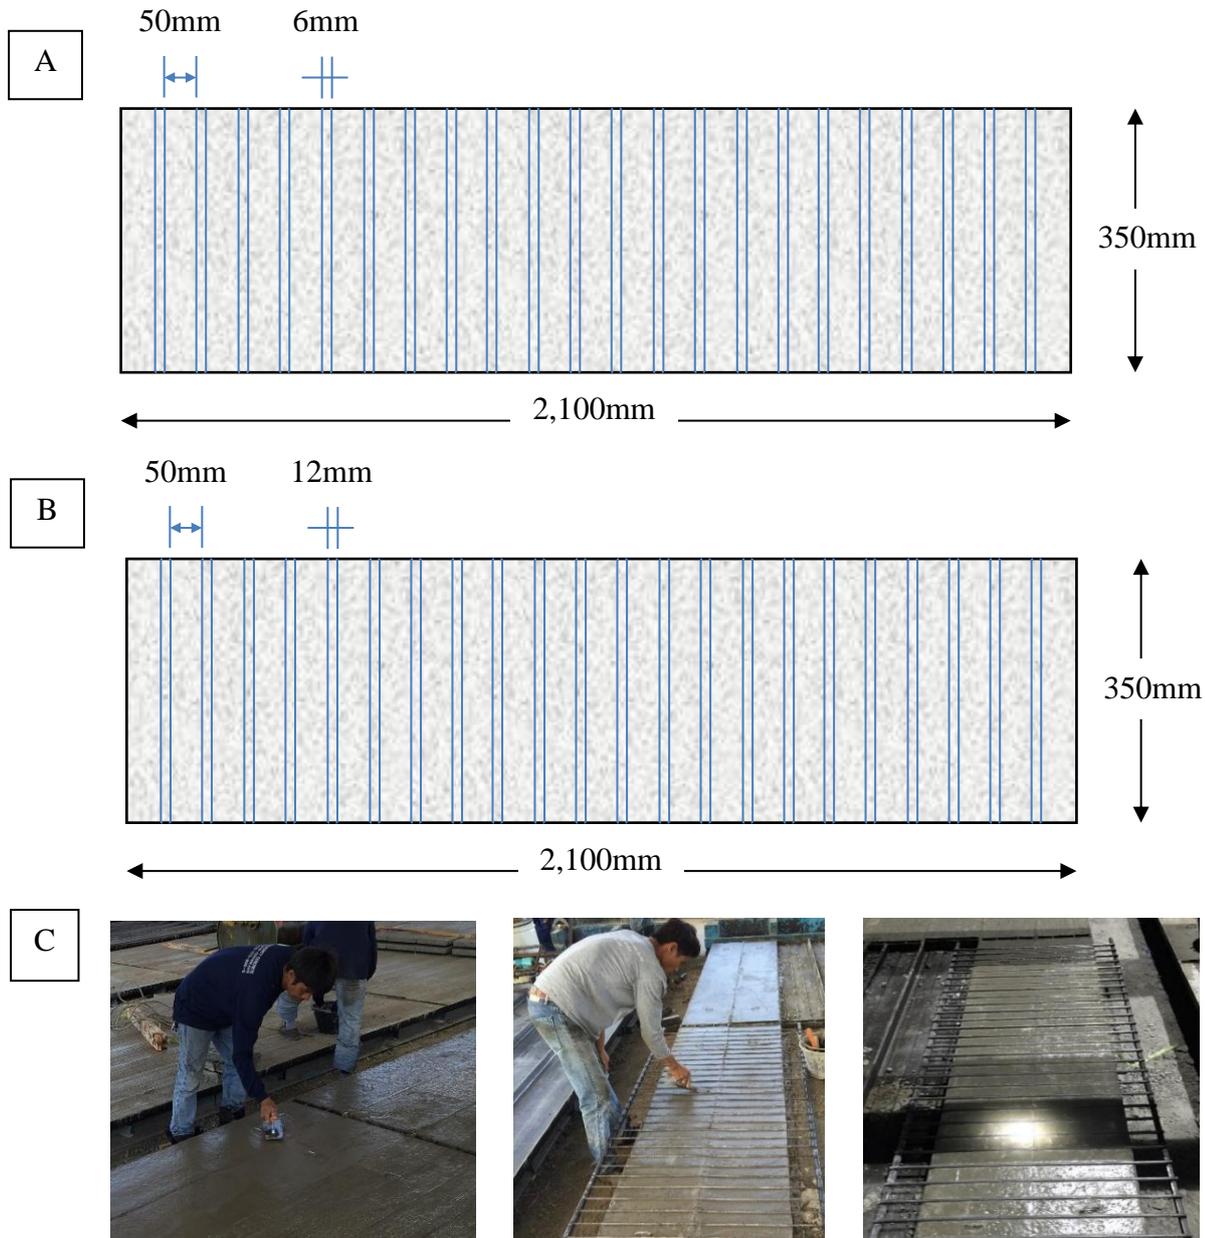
(A) Dimensions of concrete slabs with 3mm latitudinally indented surface, (B) with 6mm latitudinally indented surface (figures are not drawn to scale). (C) Concrete slabs in preparation (left: Type 1, centre: Type 2, right: Type 3)
